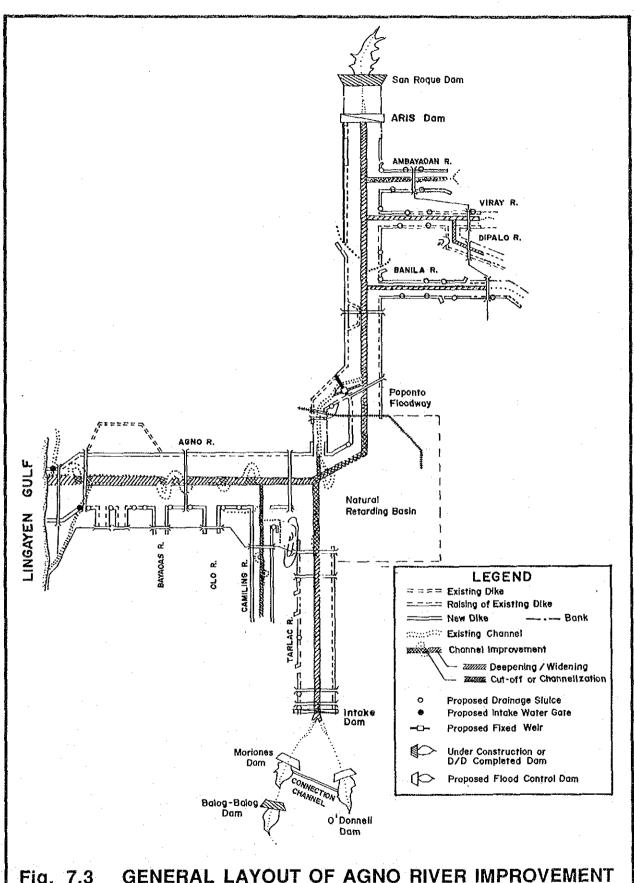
GENERAL LAYOUT OF AGNO RIVER IMPROVEMENT PLAN FOR FRAMEWORK PLAN
